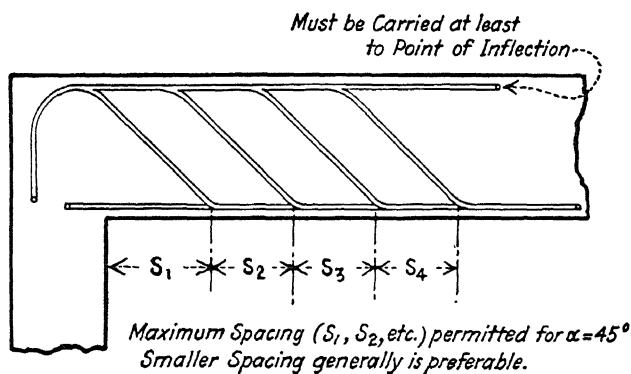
Typical Beam with Web Reinforced by Means of Series of Inclined Bars.
